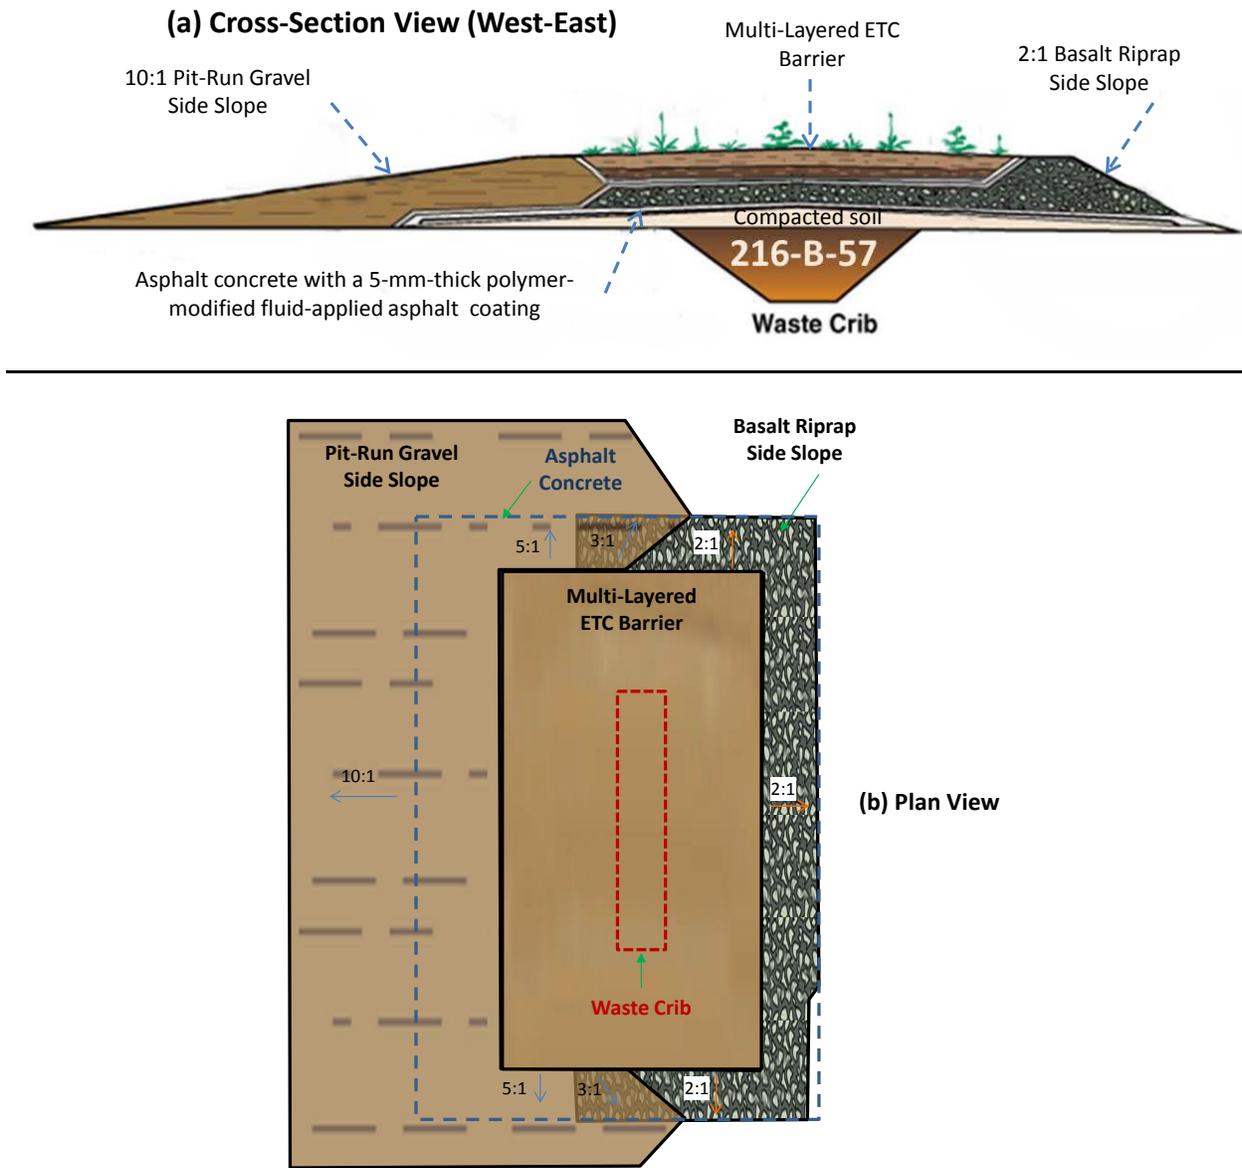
Schematic of the PHB: (a) cross-section view (west-east) and (b) plan view (approximate scale).
